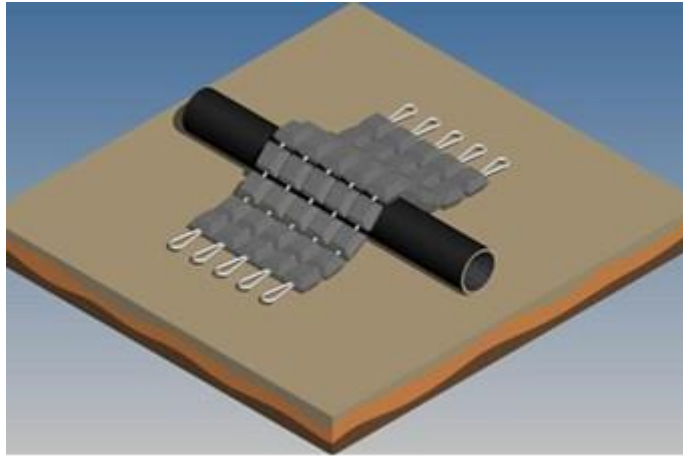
Concrete mattress for span rectification or pipeline protection or stabilisation
